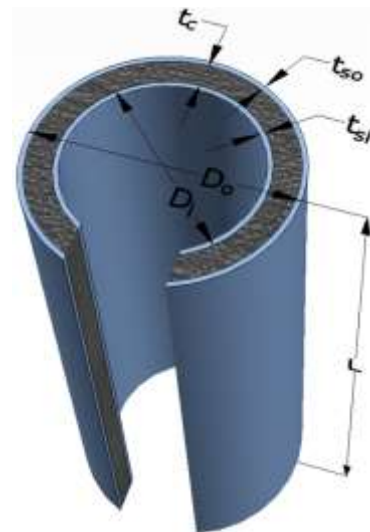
A concrete-filled double-skin steel tubular (CFDST) member with CHS exterior and interior steel tubes is shown schematically, and the geometric notations used here are described.
